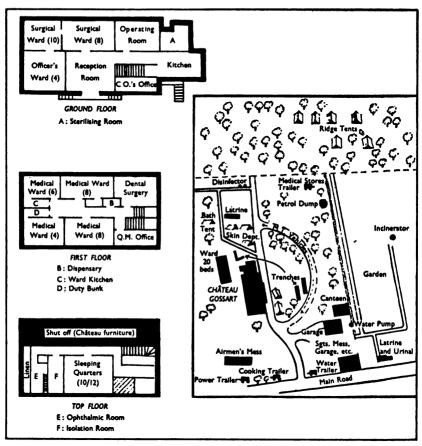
Plan of No. 2 M.R.S., Château Gossart.
